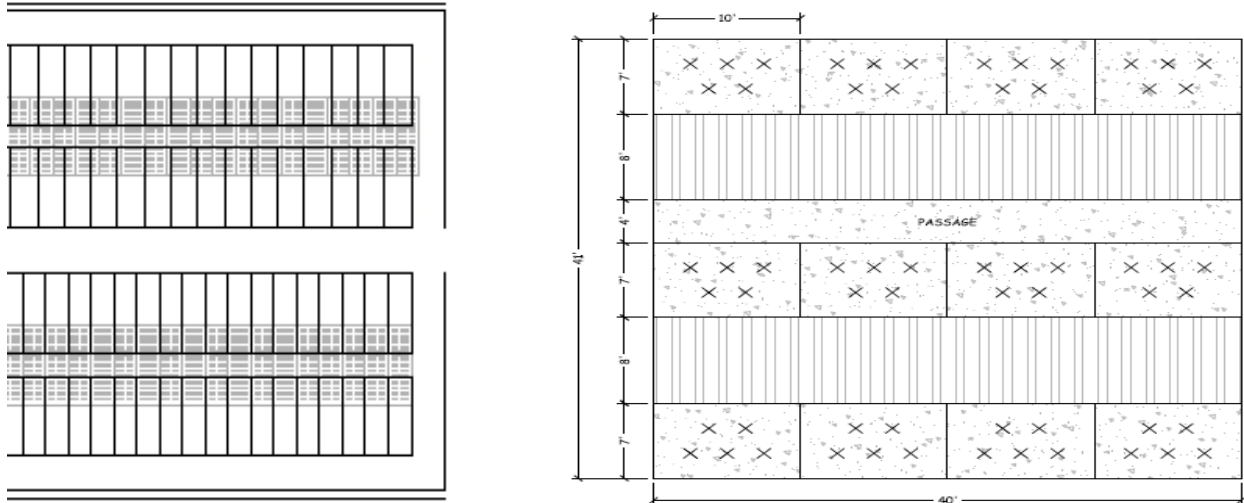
Converted gestation stall sections (or barns) with floor feeding
